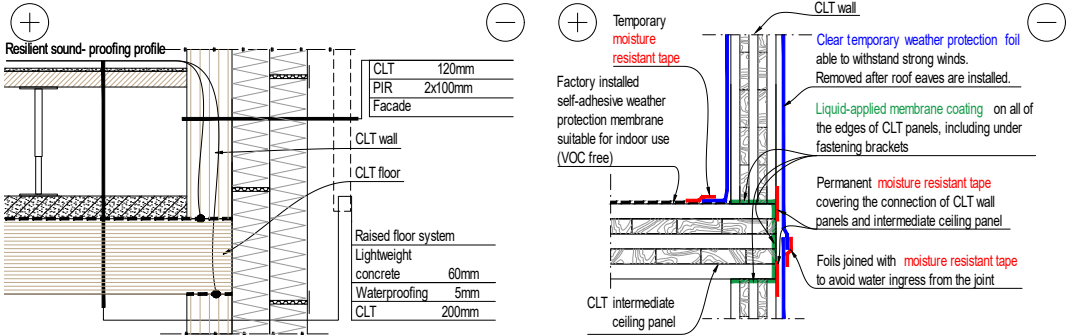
Design drawing (left) of the intermediate ceiling to external wall connection and our proposal (right) of wetting mitigation practices.
